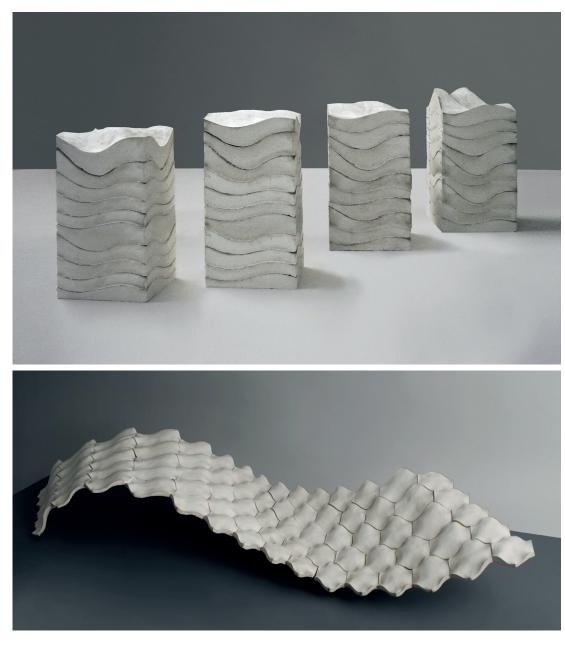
Prototypes produced using the CASTonCAST system. Above: Components in stacks. Below: Stackable components assembled together giving shape to a freeform shell.
